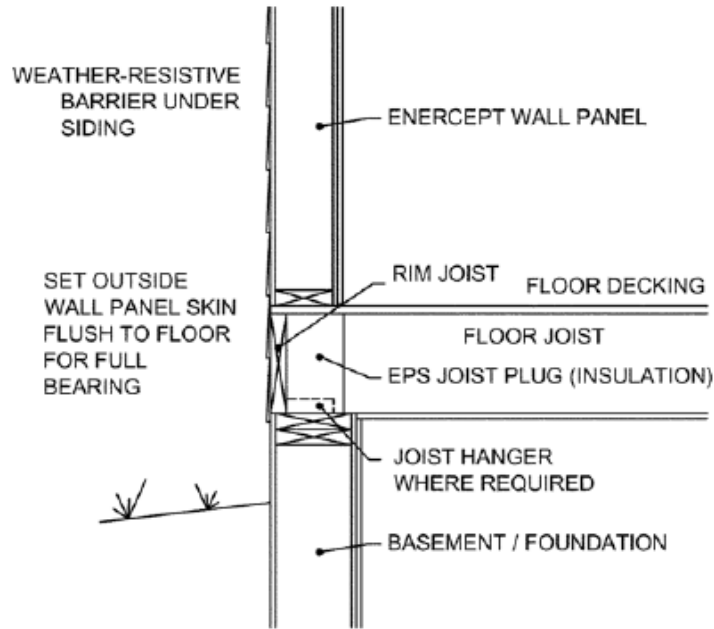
TYPICAL WALL-TO-FLOOR DETAILS
